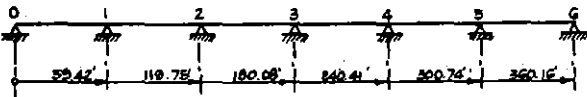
Structure of Example 2 (six-span semi-continuous bridge)
